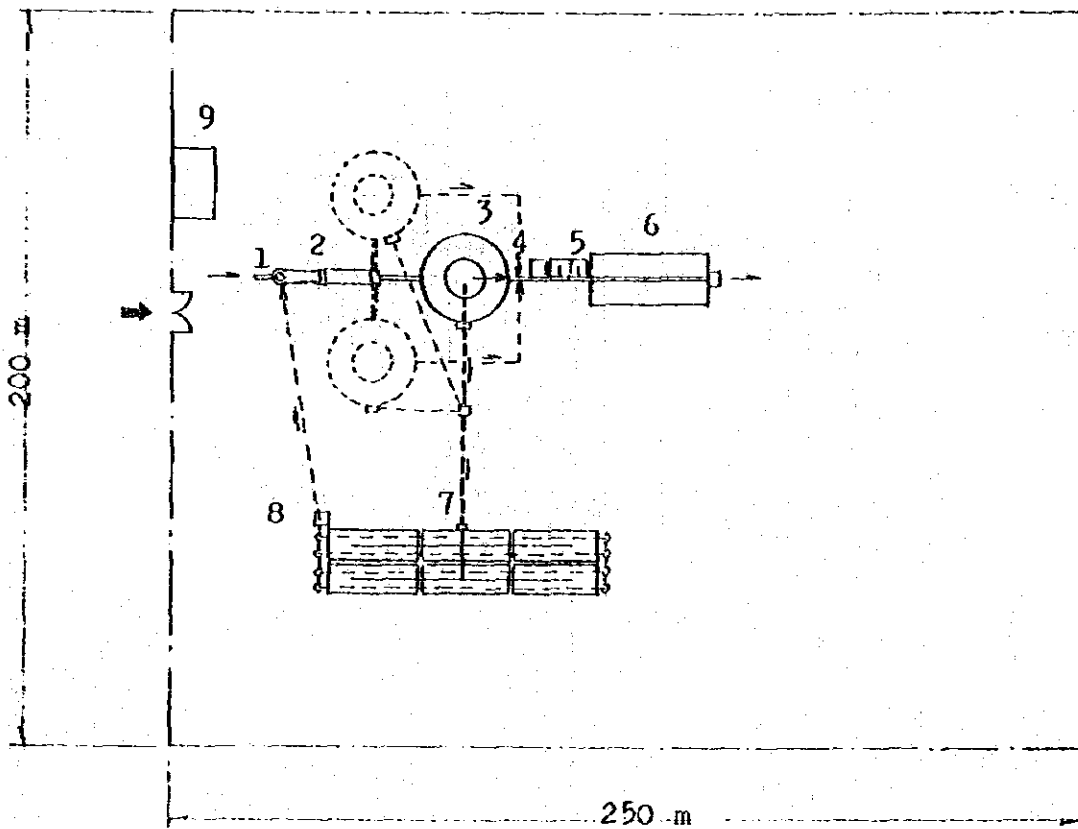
Masaid Sewage Treatment Plant Layout
